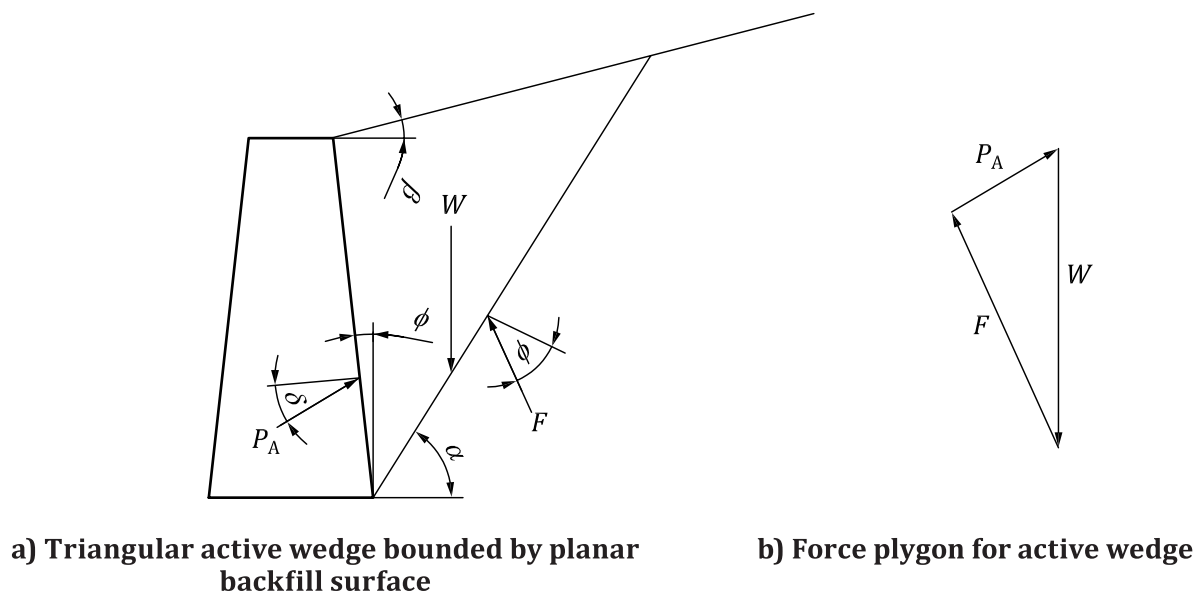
Active thrust on a wall under minimum active earth pressure conditions
